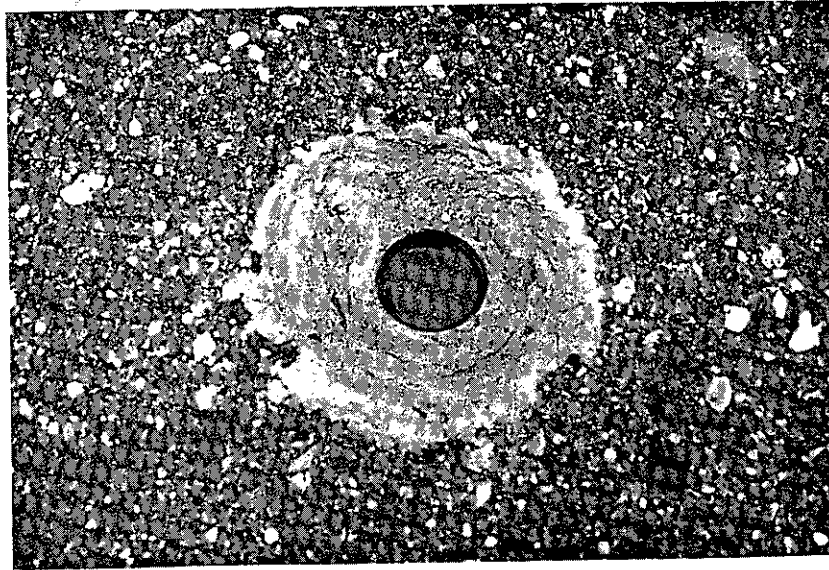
Close-up of Well 5 several hours after a rain; pavement is damp, but no surface water; hydrostatic head in base raised water to 1 in. from top of pavement.
